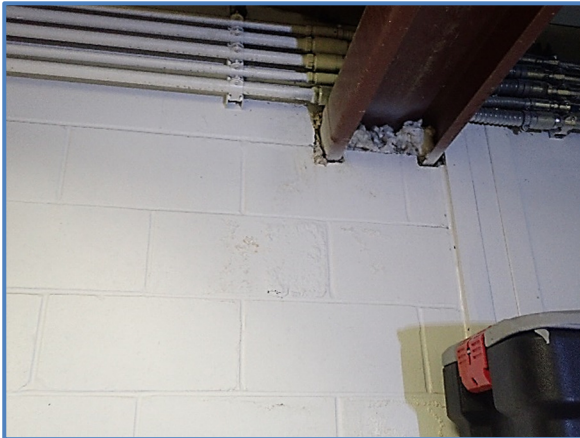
Areas of the painted CMU block wall, located on the second-floor of the main building which is a storage area and maintenance shop. The paint is peeling off the block wall, likely due to the CMU block wall absorbing water.
